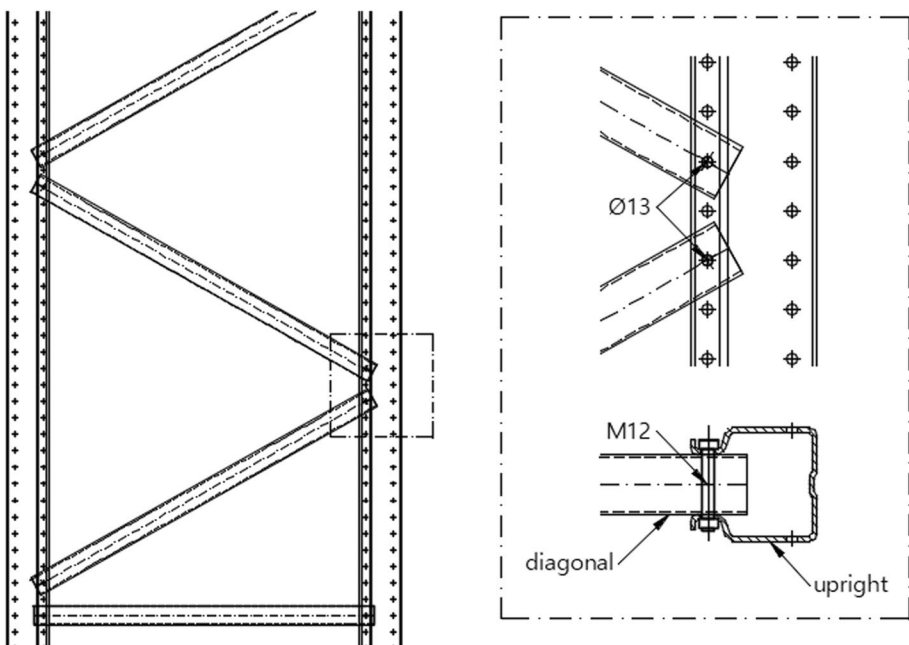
Typical diagonal-to-upright bolted connection, using an M12 bolt with two shear planes
